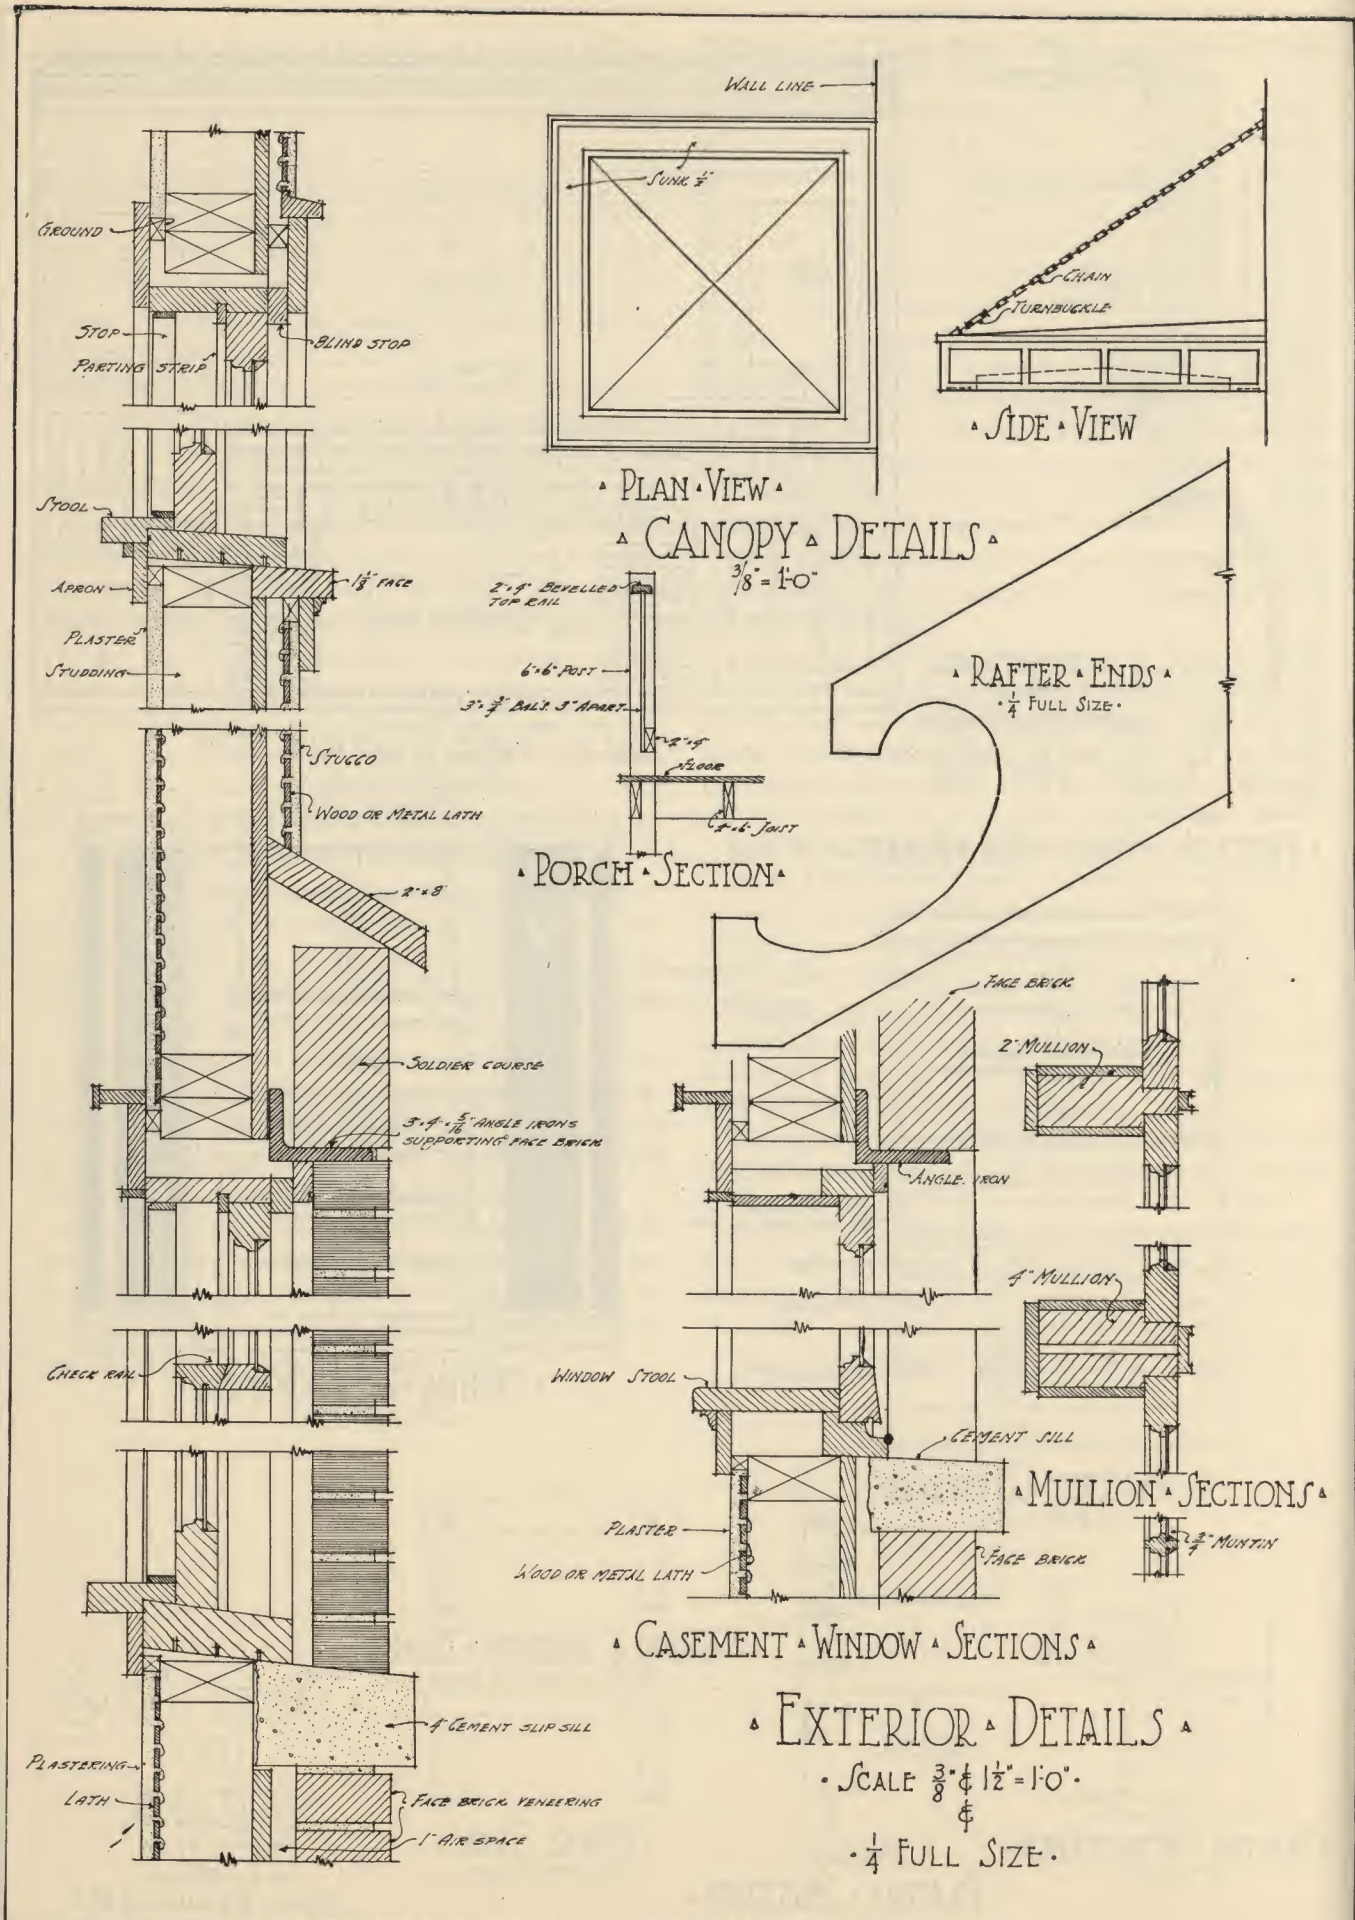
Plate XXX. Exterior Details of Construction, to Scale, of Modern Residence, Design No. 6636, Shown on Page 116.
